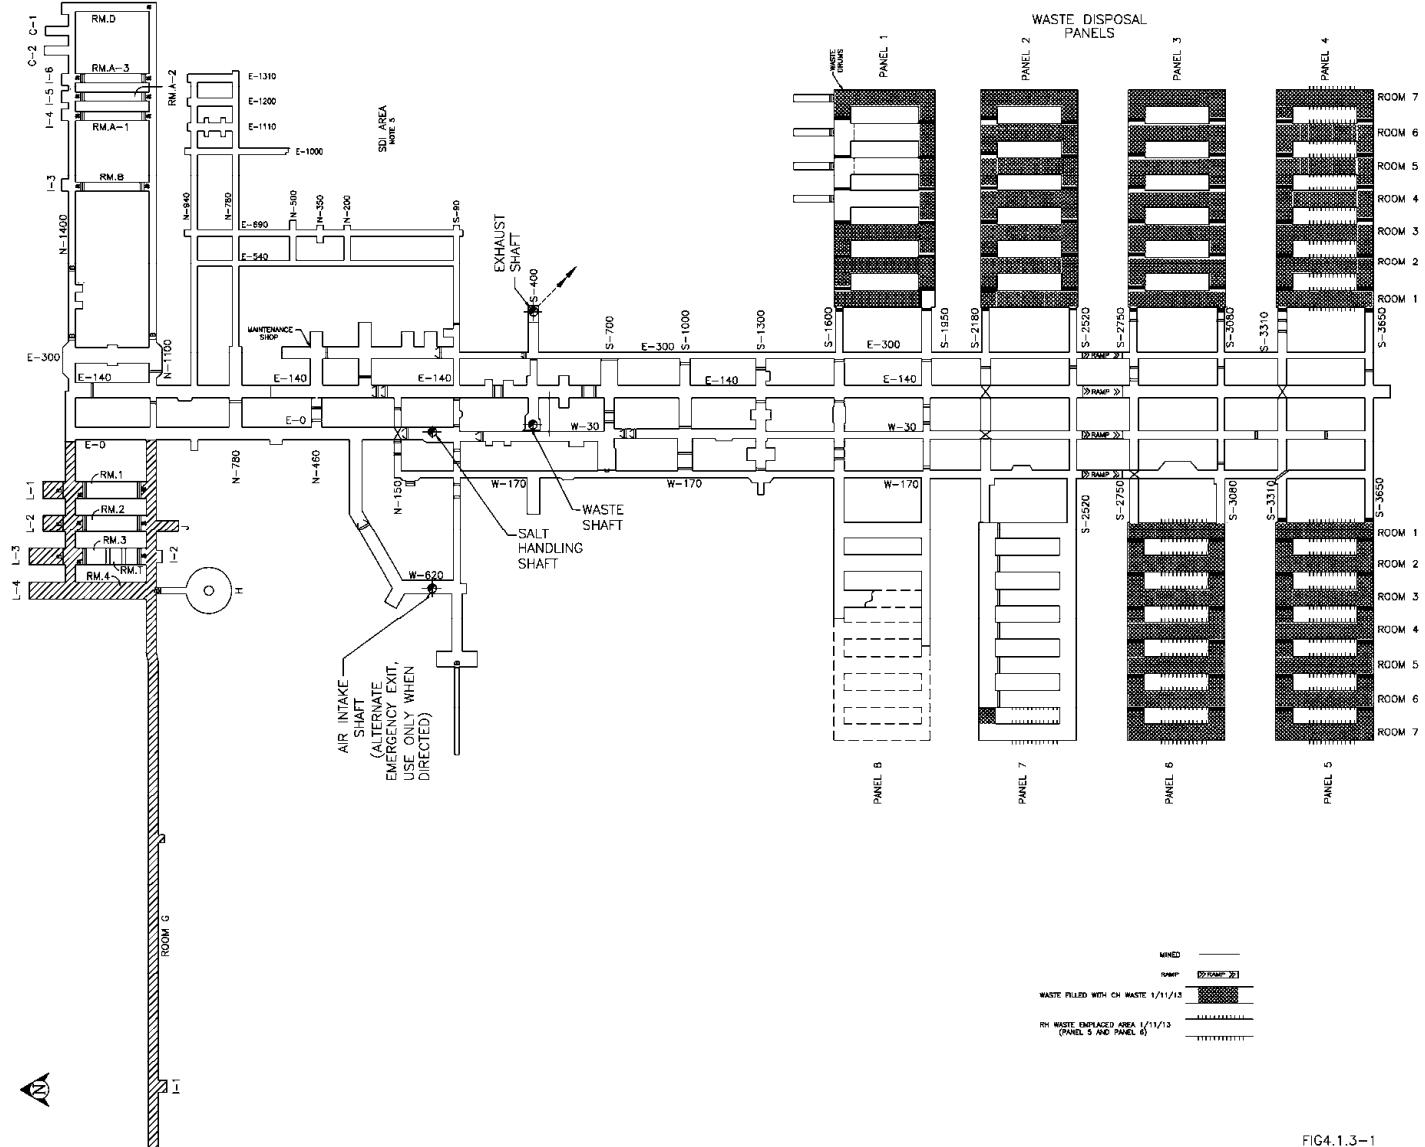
Layout of the Current (2014) Waste Disposal Region at WIPP
